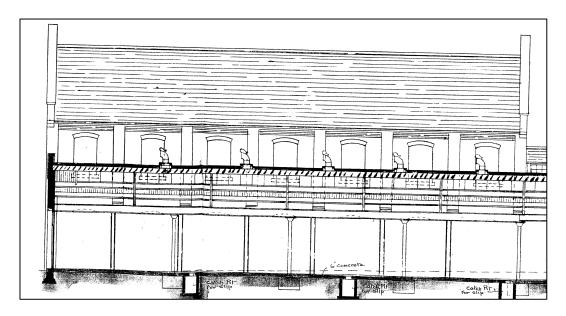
North elevation of Building S with Building O (single-storey to the front)¹⁶
